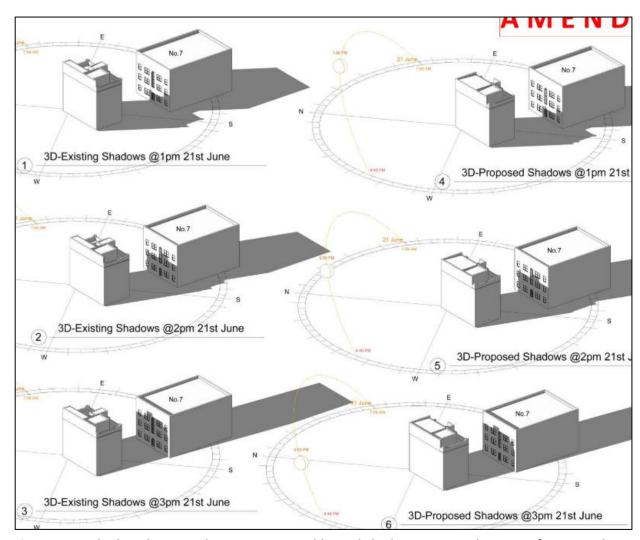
3D shadow diagrams demonstrate no additional shadowing to northwestern facing windows to 7 Beach Road. (Source: DBCF Pty Ltd, 2024)
